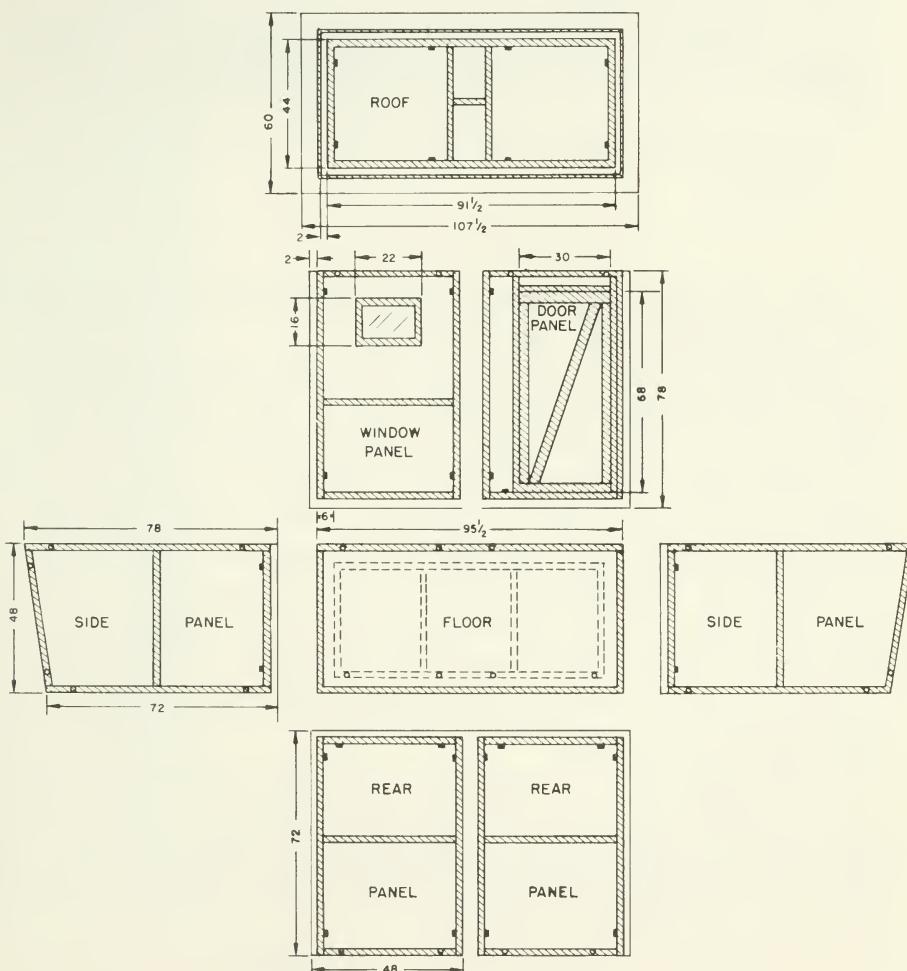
Expanded view of instrument shelter, showing construction and arrangement of panels. All dimensions are in inches.
